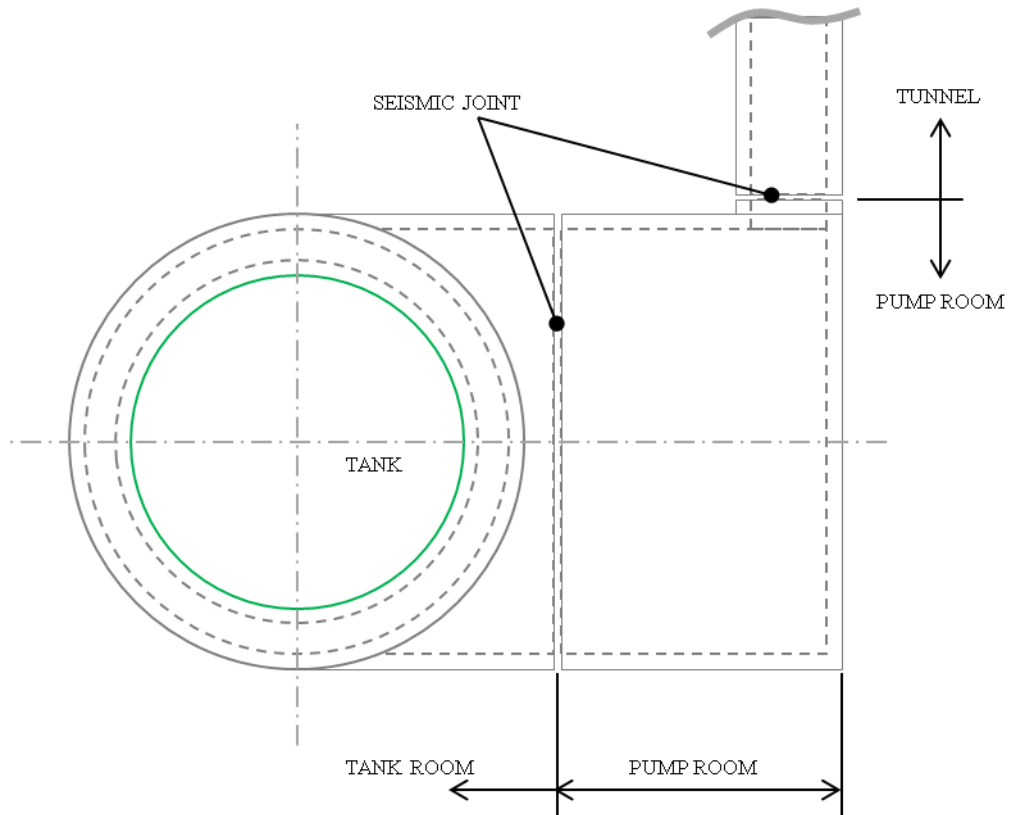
Plan, CST Structure and Tunnel
